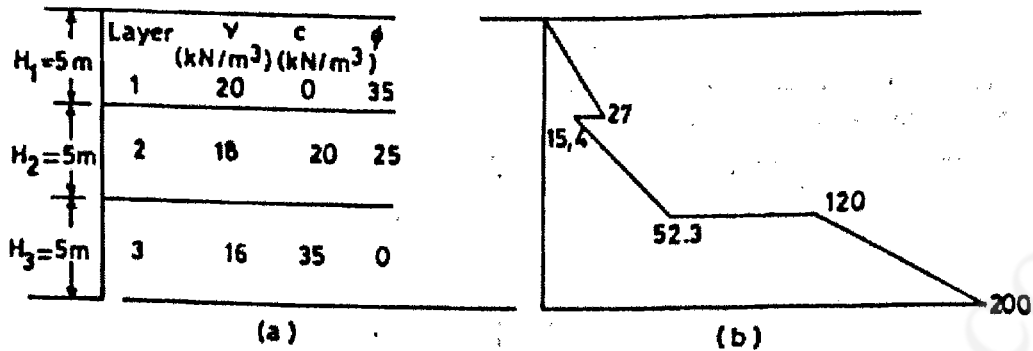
(a) Retaining wall with backfill (b) Earth pressure diagram—Example 12.6
